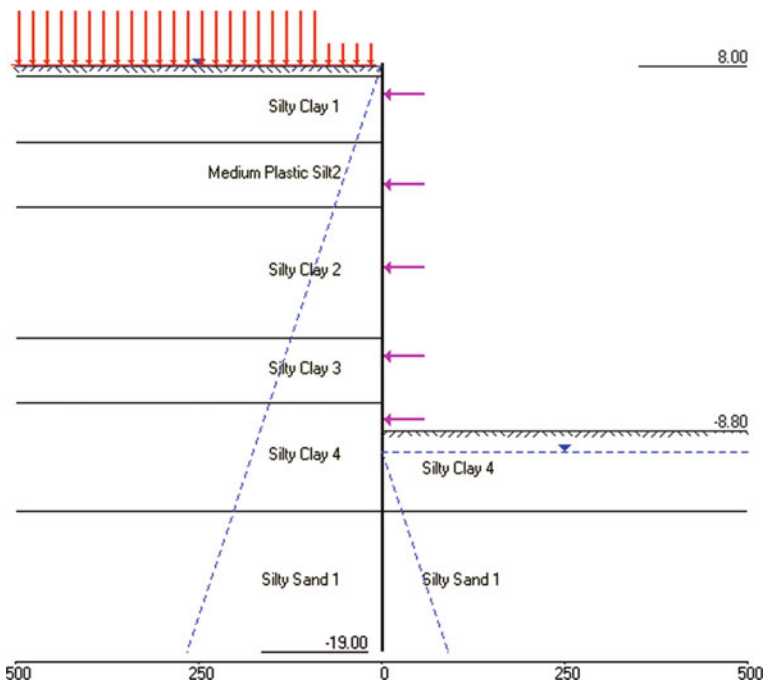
Typical wallap model (subgrade reaction approach)
